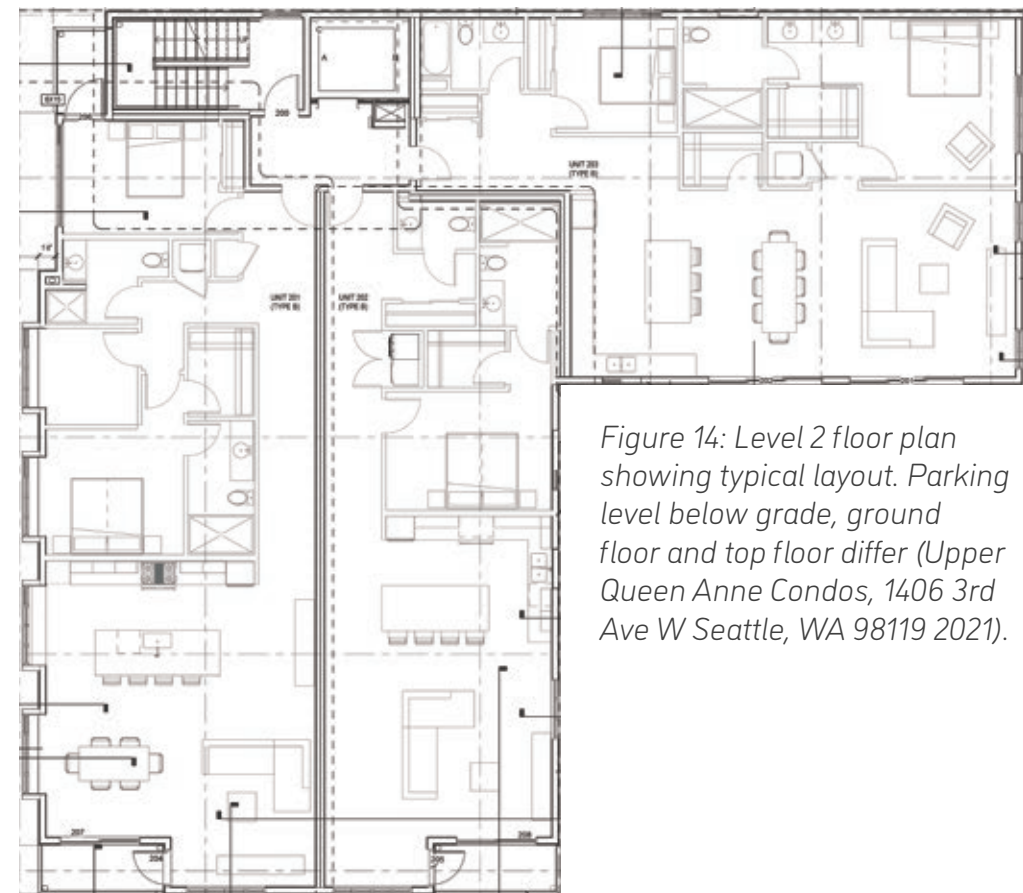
Level 2 floor plan showing typical layout. Parking level below grade, ground floor and top floor differ (Upper Queen Anne Condos, 1406 3rd Ave W Seattle, WA 98119 2021).
